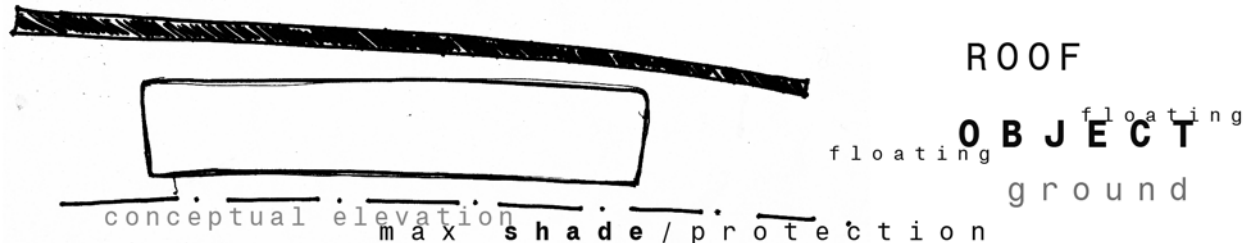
Conceptual elevation of BRT station [Source: Author]
